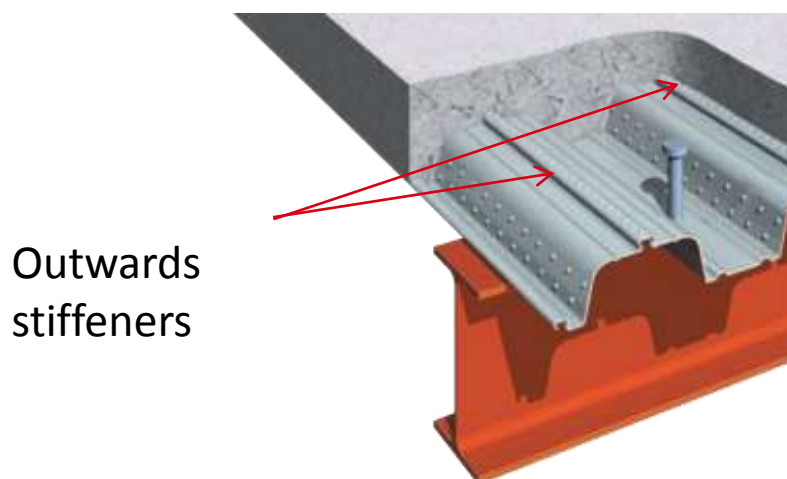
Steel sheeting with outwards stiffeners
